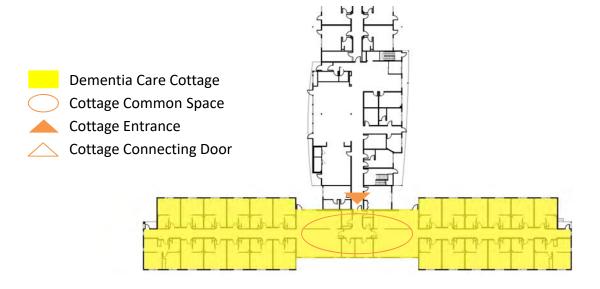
Dementia cottage layout analysis in Wainwright Building
